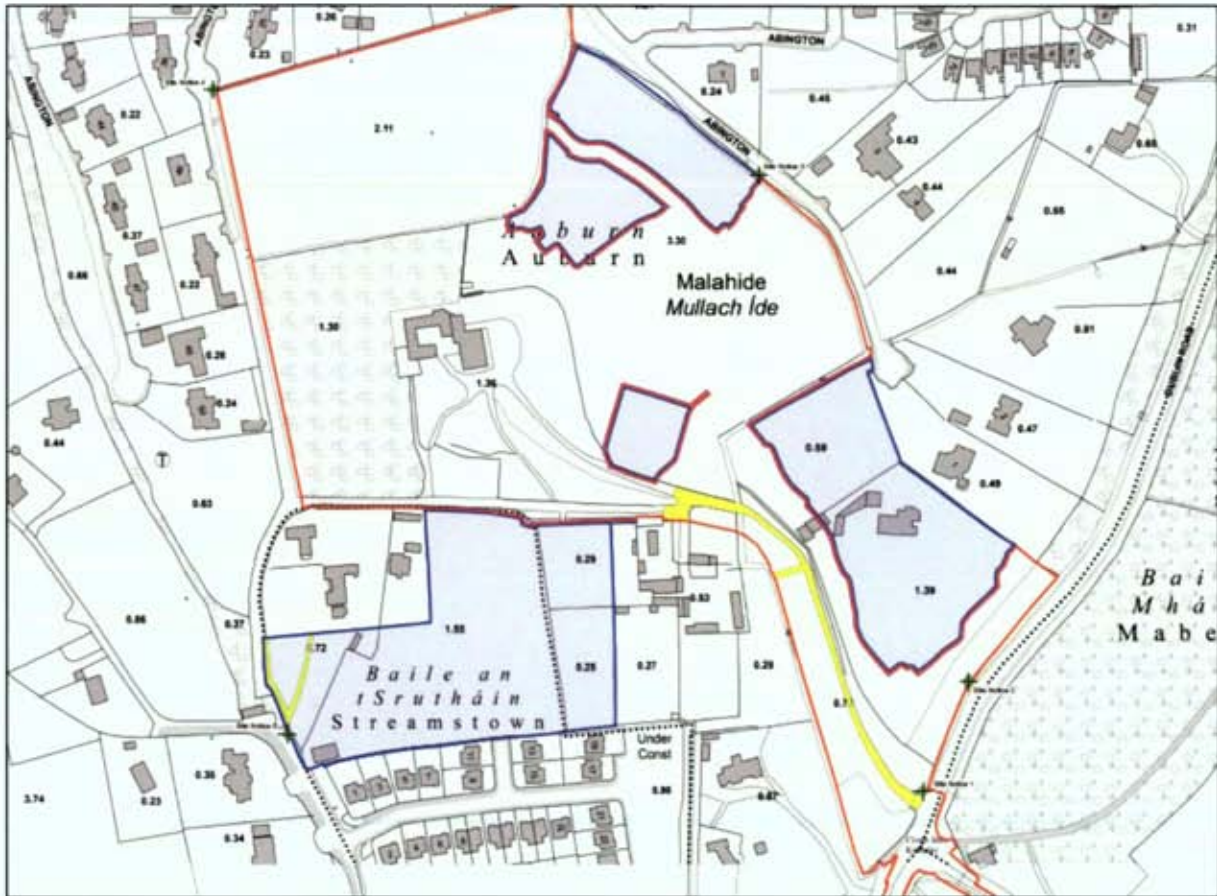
Outline of Site Boundary excluding underground rising main along Back Road and Kinsealy Lane (source: CCK Architects)
